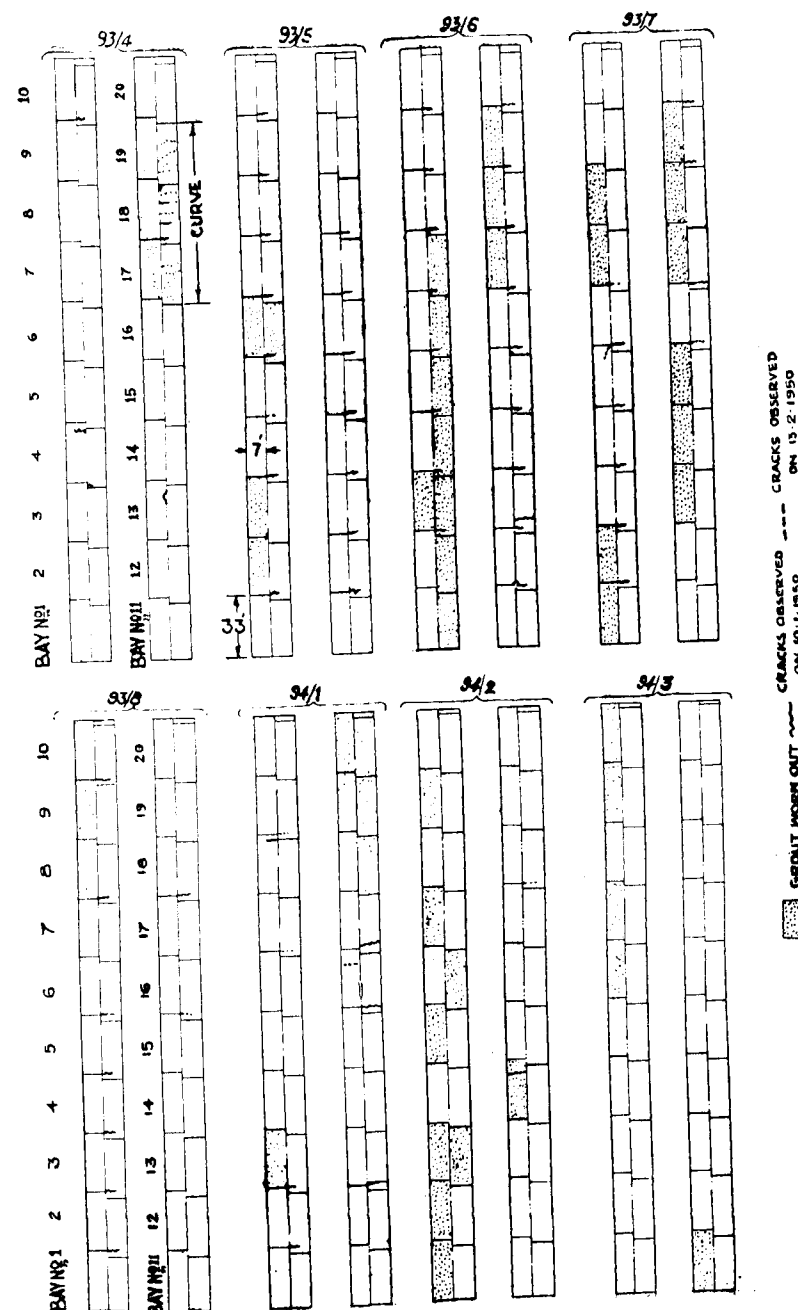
Condition of the Grouted Road, 93/4 to 94/3 of M. C. Road.
